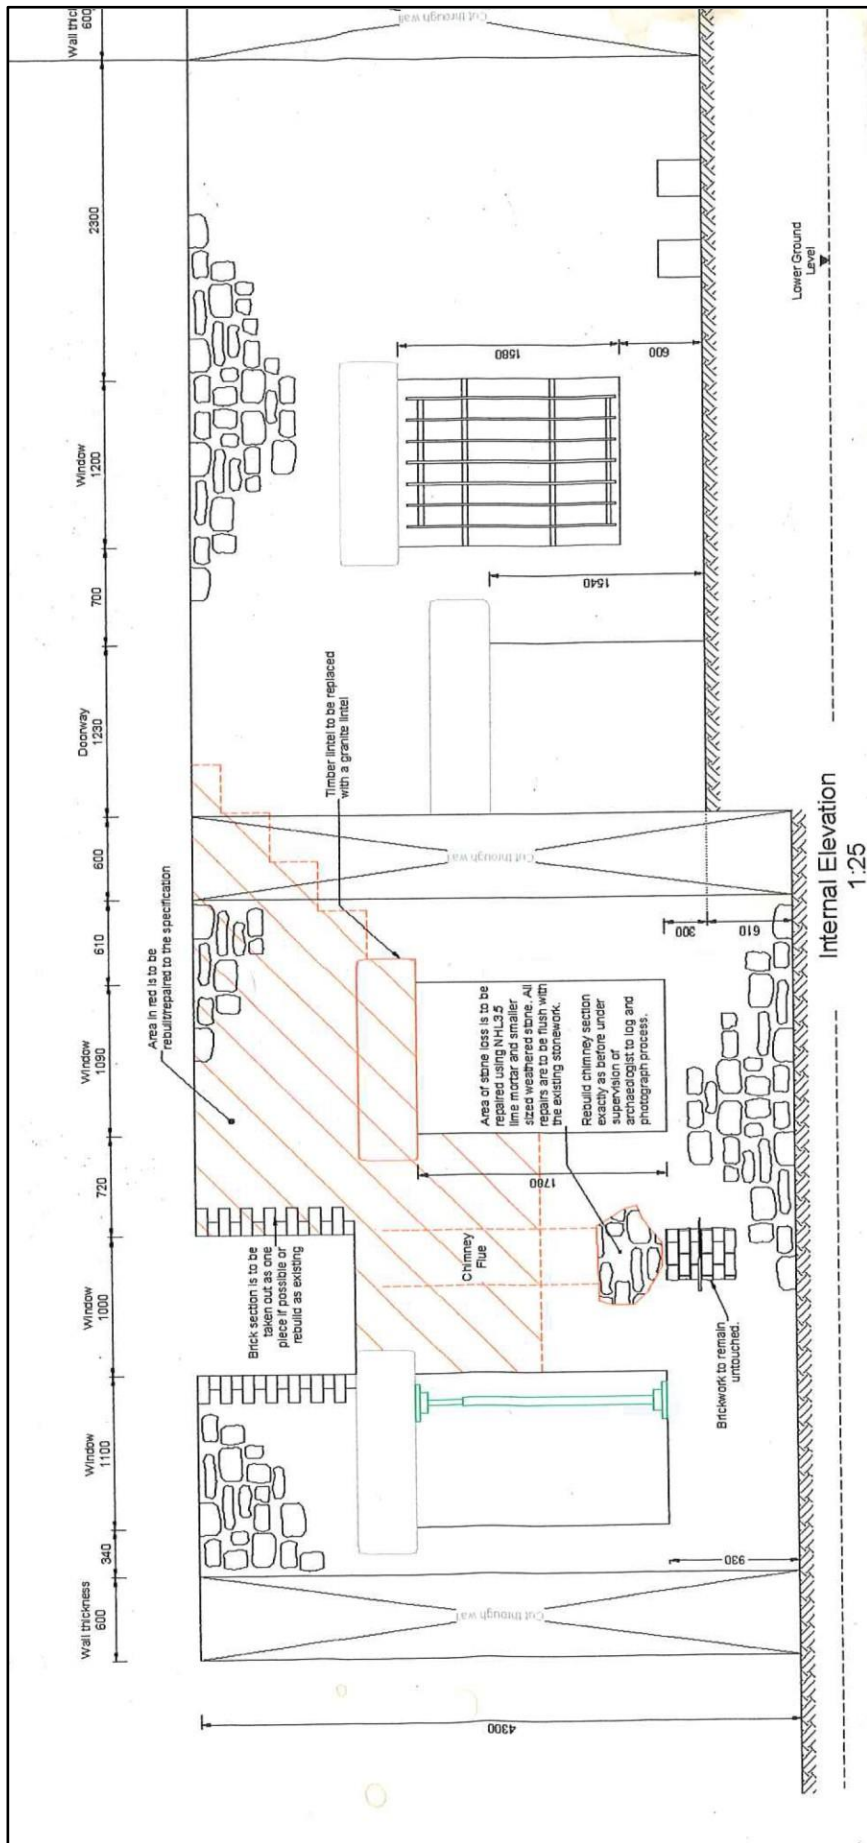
Information supplied by CORMAC Ltd showing the detail of the extent of the proposed reconstruction and repair works for the internal elevation of the walling of the building.
